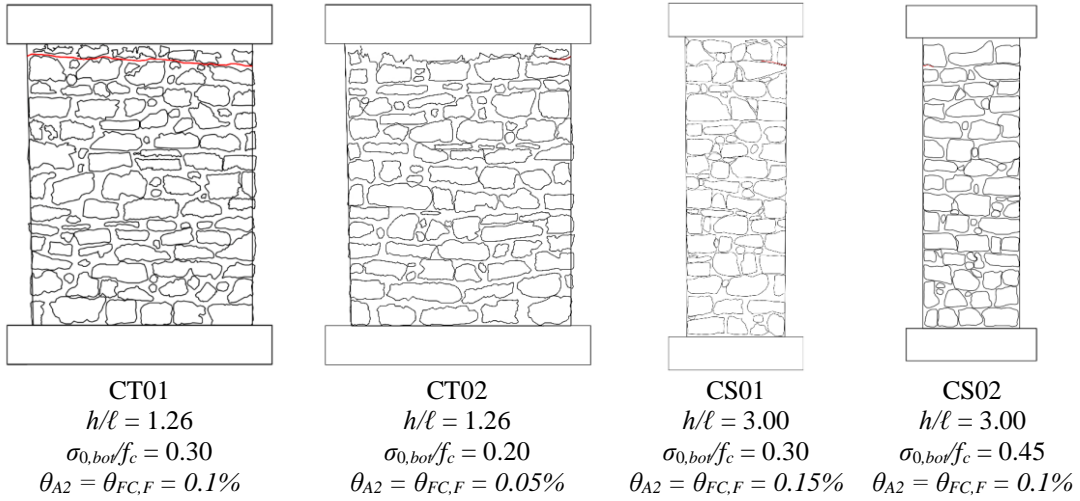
Damage conditions the four specimens at first cracking for flexural rocking.
